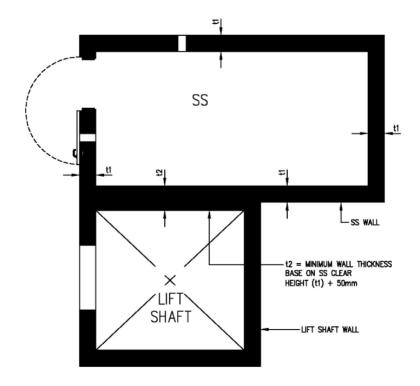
LIFT SHAFT ABUTTING SS TOWER
